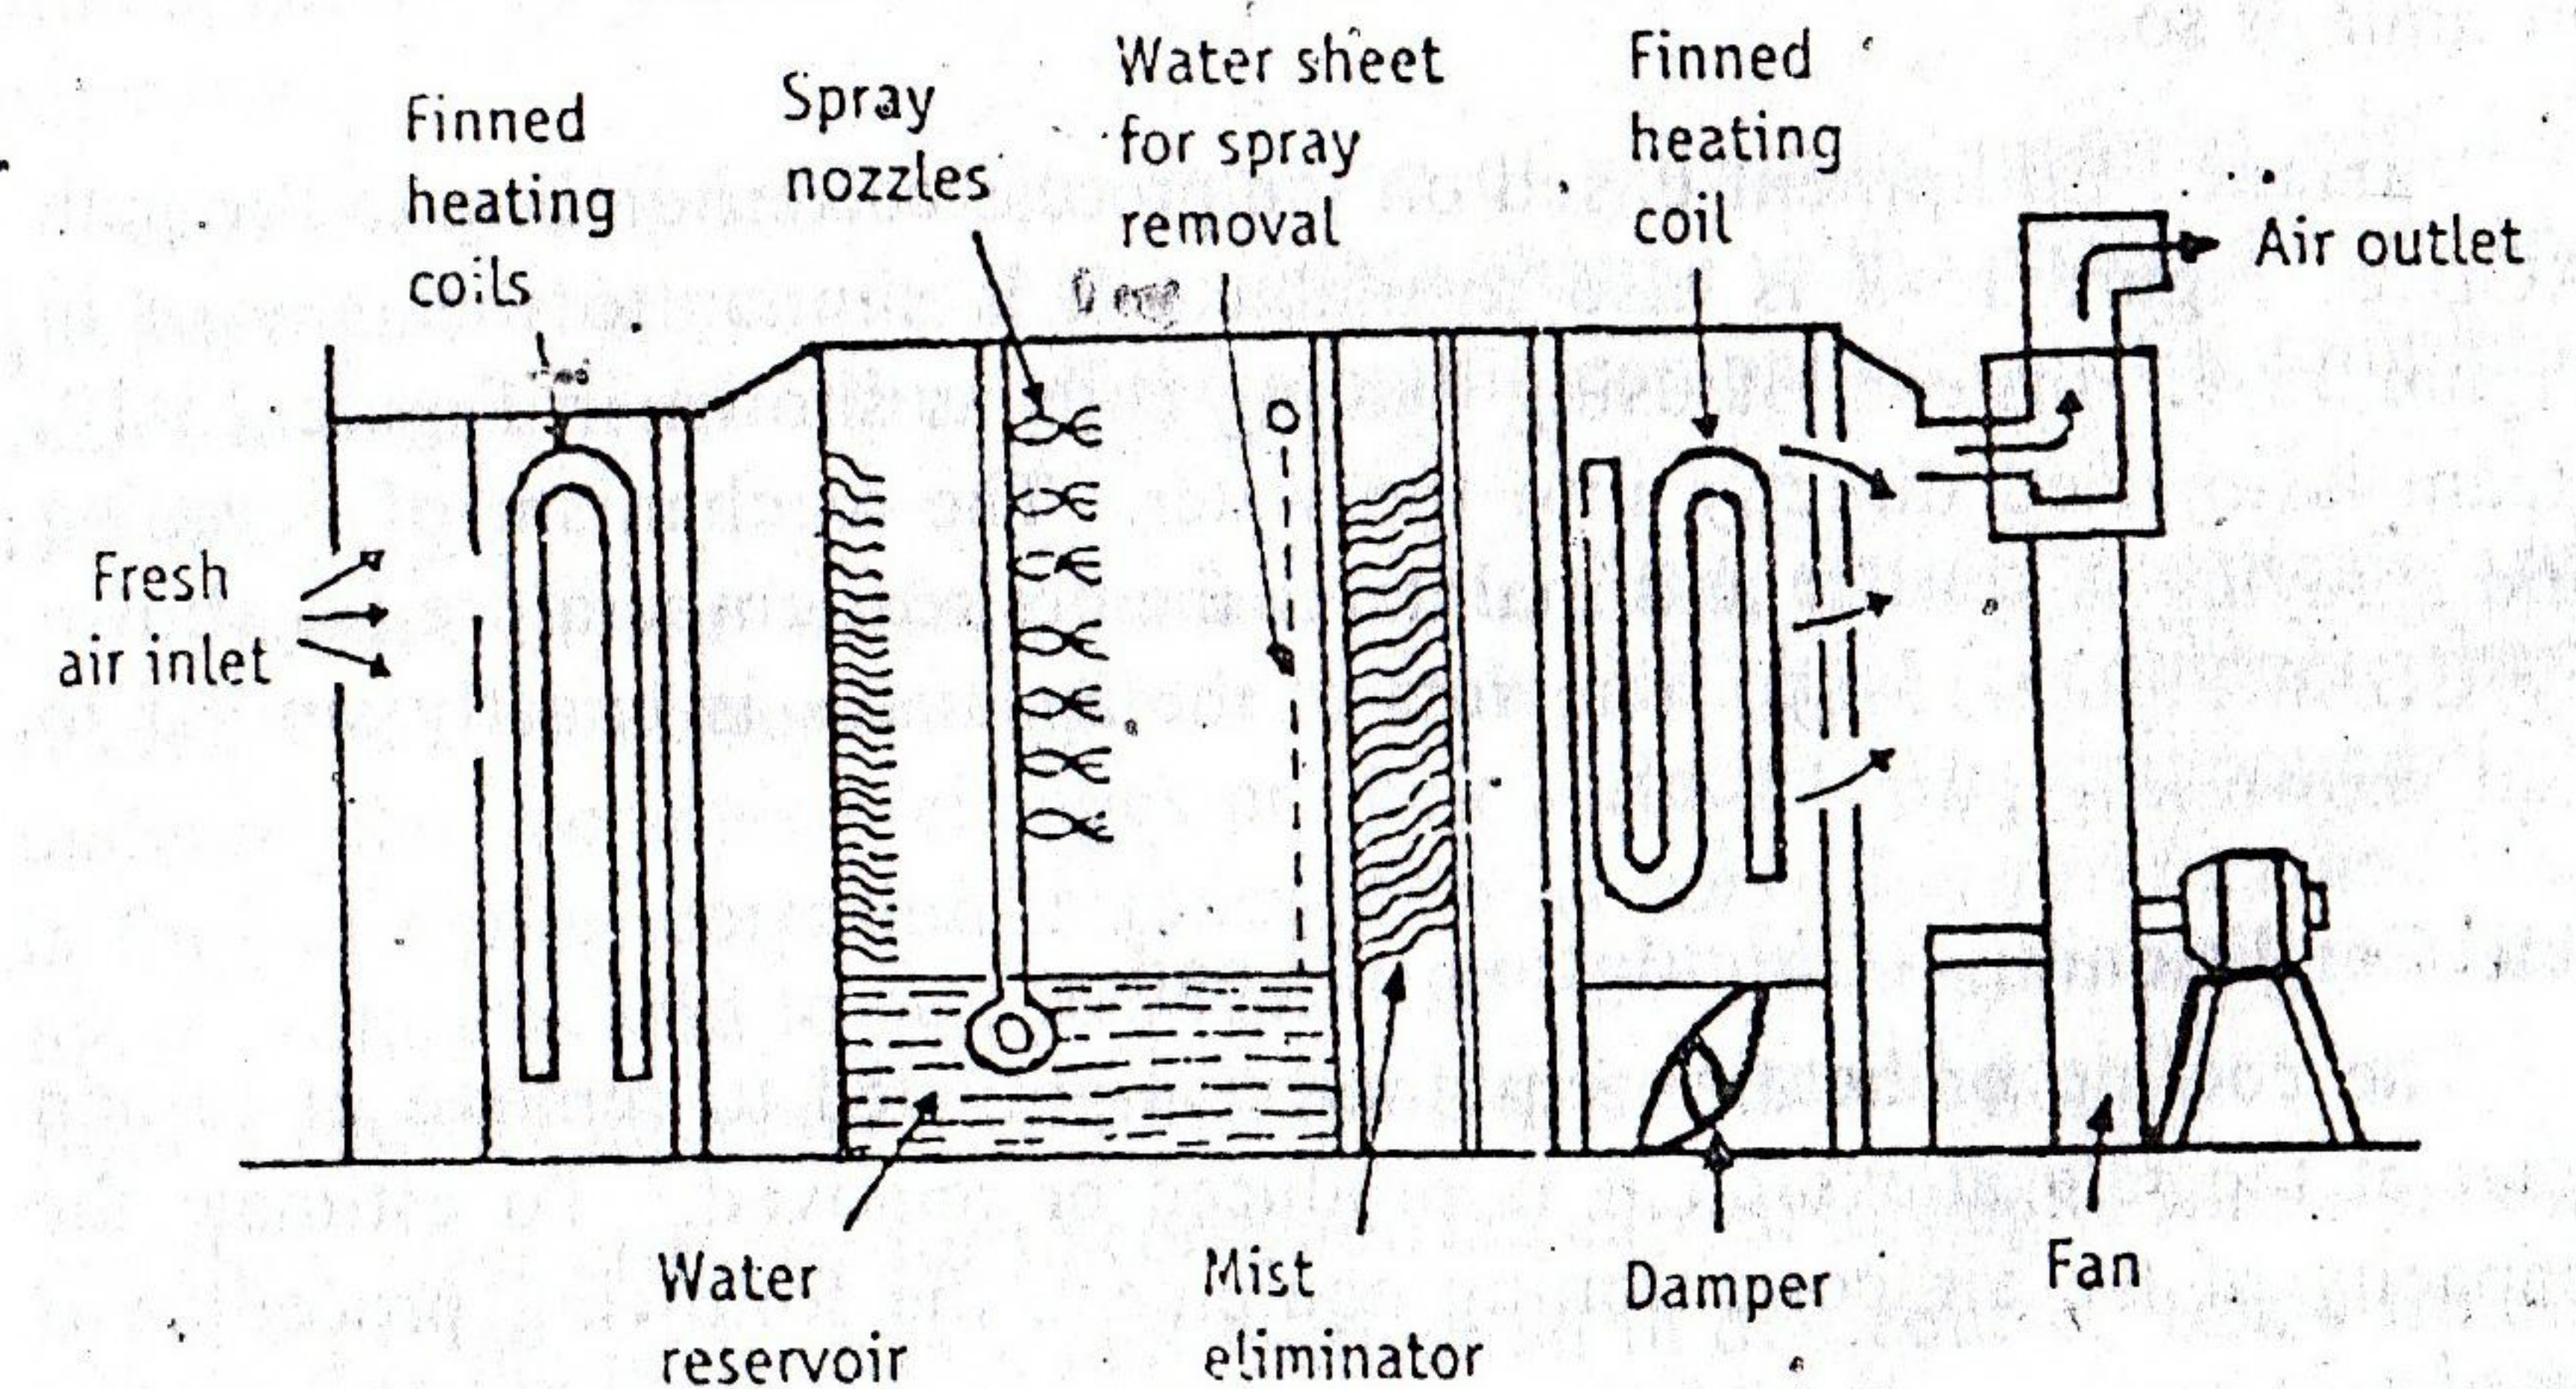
Typical, central-stationed air conditioning unit and control systems.
